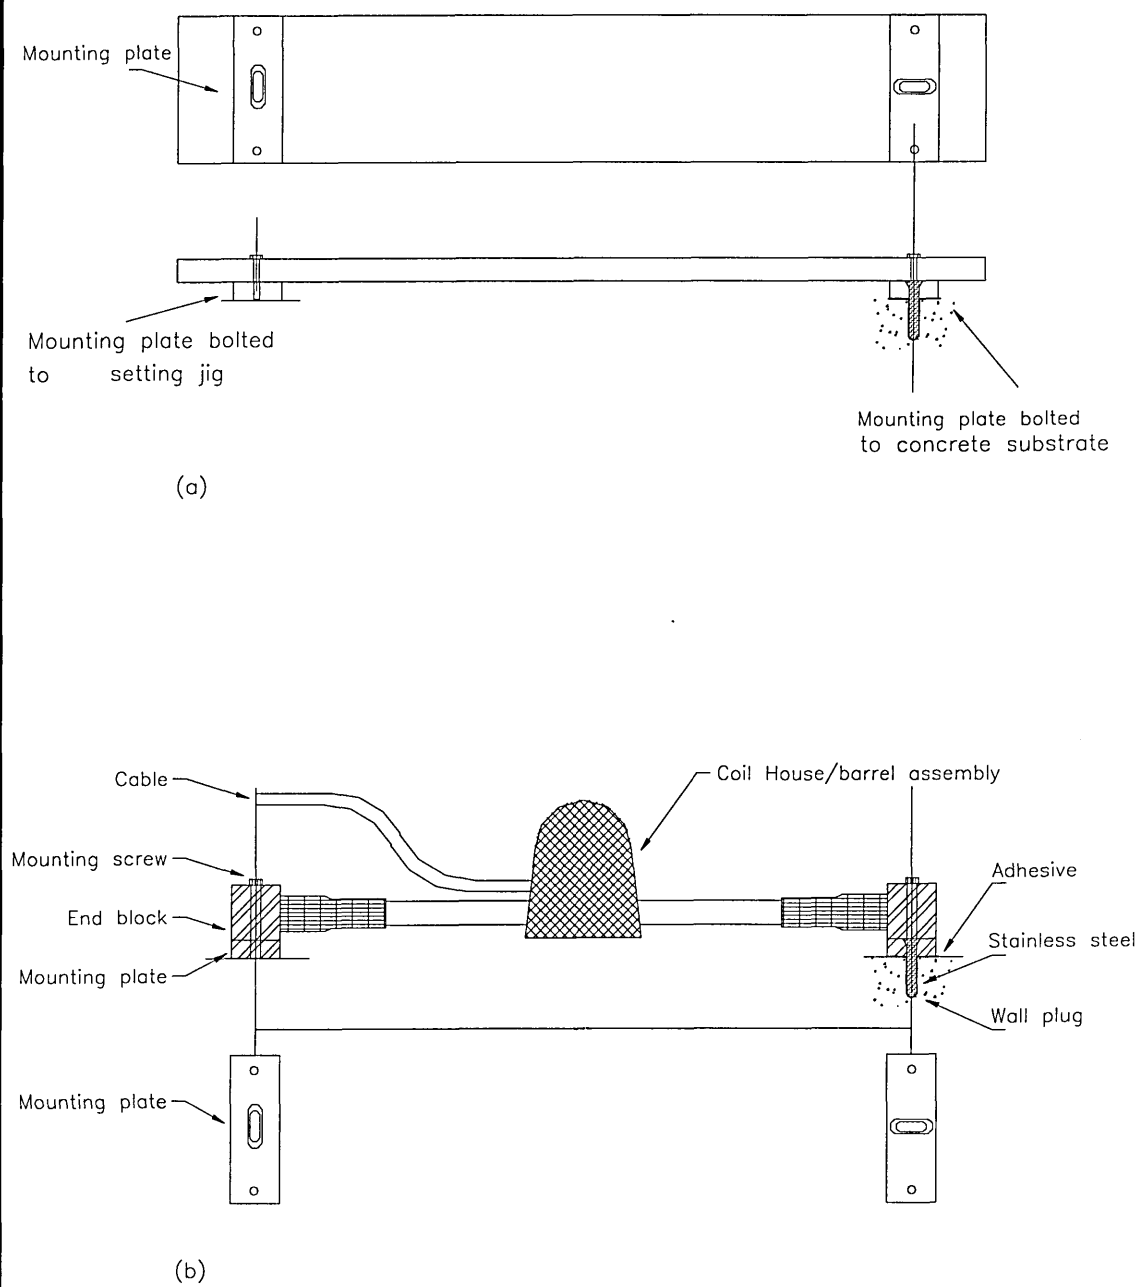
Vibrating wire surface gauge (type TSR/5.5/SWP) with bolted connections (a) Setting jig (b) Gauge in position
